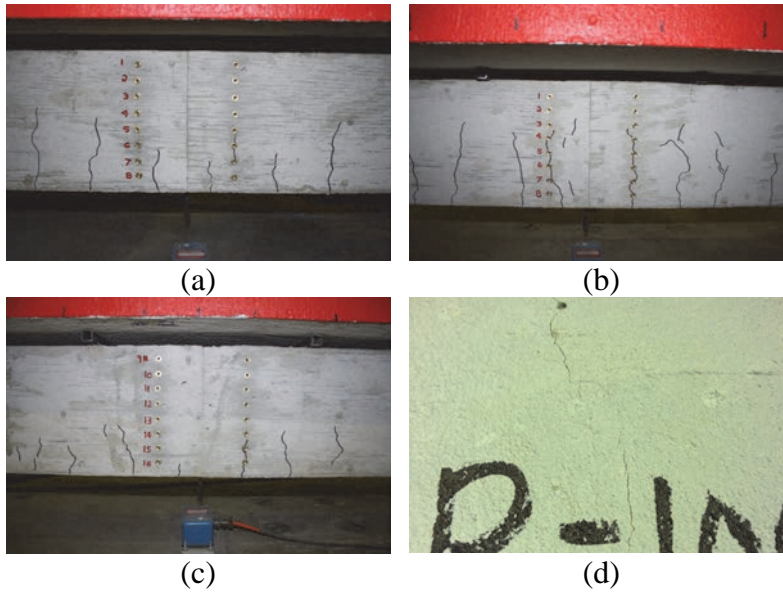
Beam cracking [note that the cracks were hairline; but, they have been highlighted for easier viewing in Figs. 8(a-c)]: (a) flexural cracking on CC-0-7; (b) flexural cracking on CC-100-7; (c) flexural cracking on UC-50-7; (d) shrinkage cracking on top surface of UC-100-28
